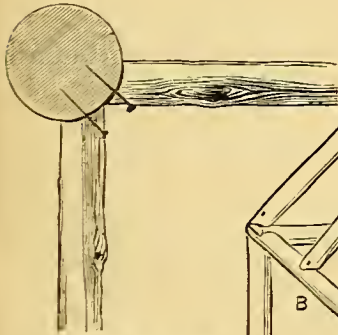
ENDS OF CROSS-PIECE OR LEDGERS.
